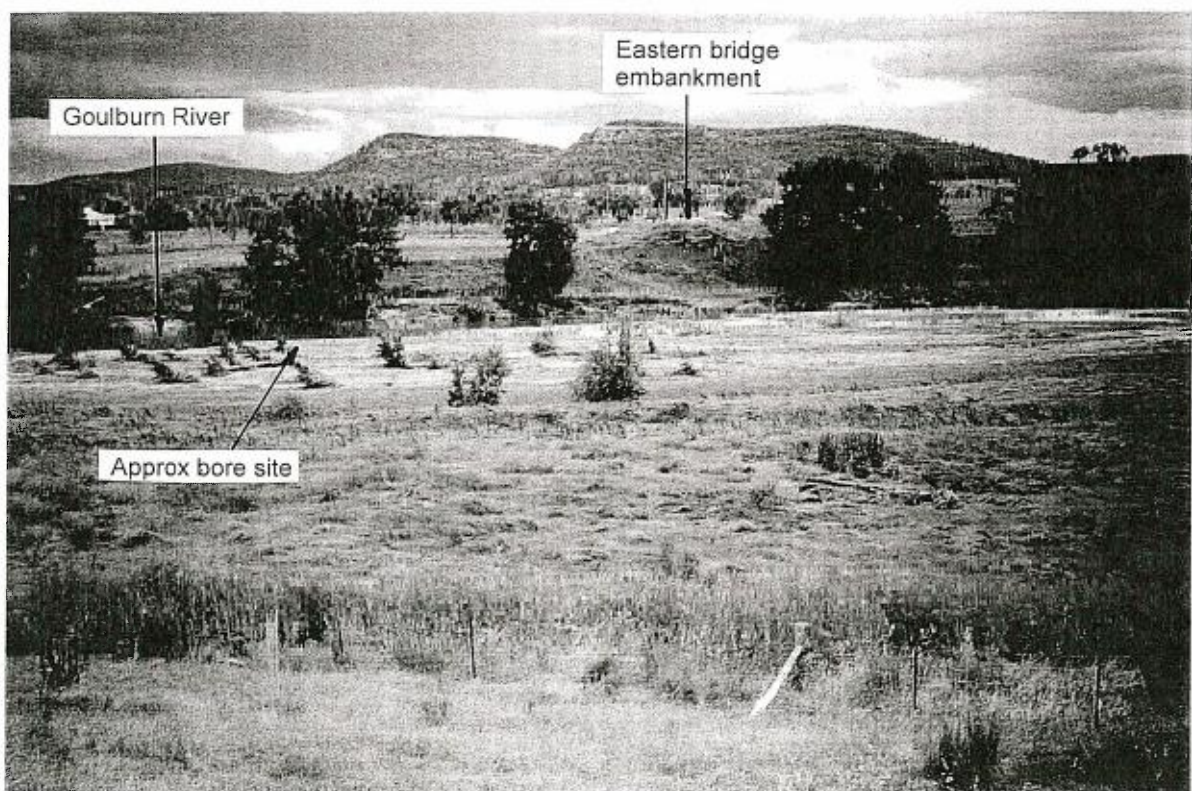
Goulburn River and river flats in vicinity of old road bridge
